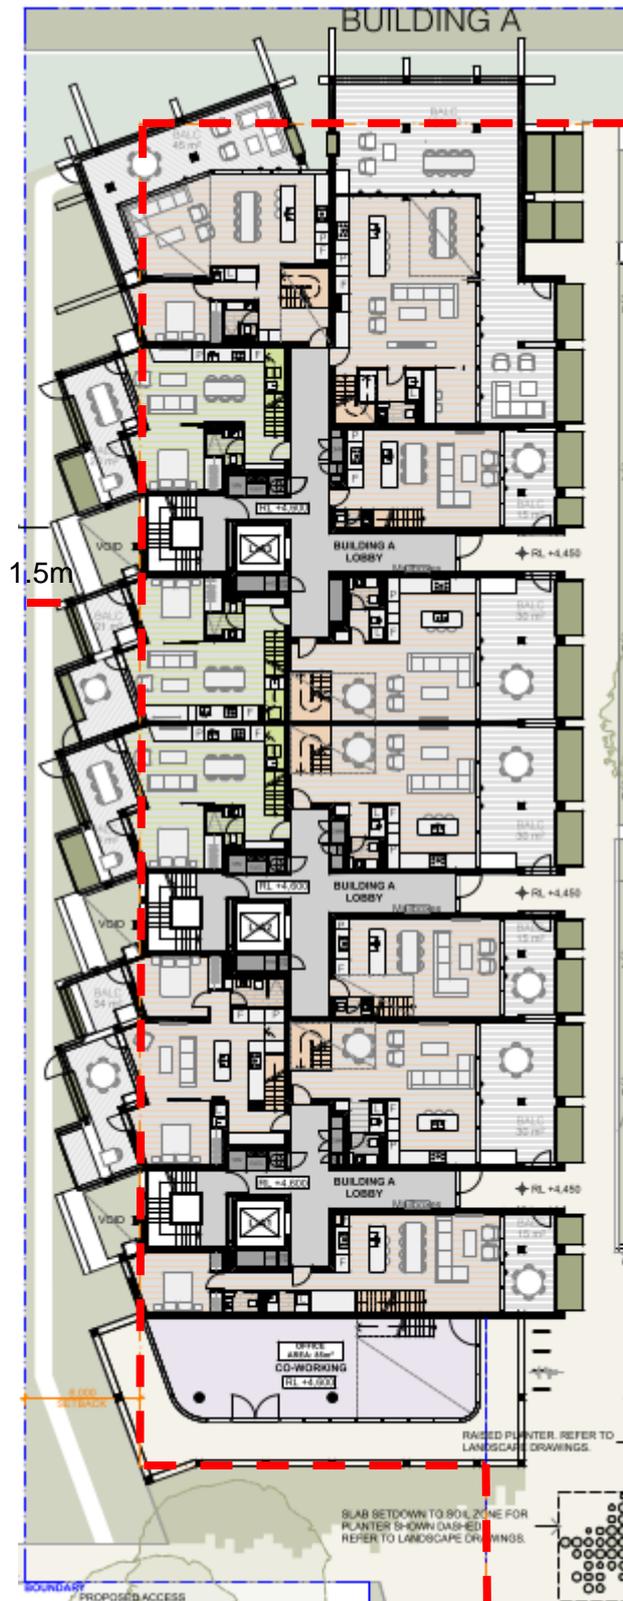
Proposed ground floor southern side of site adjoining Sydney Park, reduced to a minimum of 1.5m.
